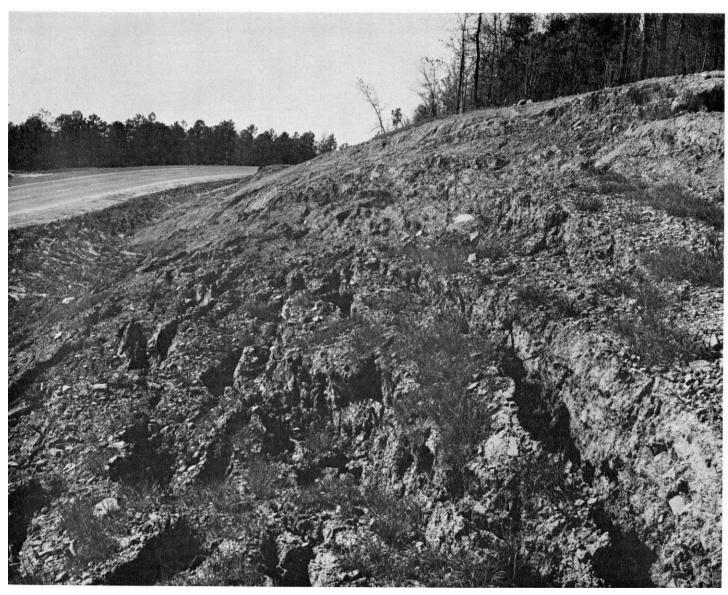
Slumping of unstable soil in highway road cut. The soil is Enders fine sandy loam.
